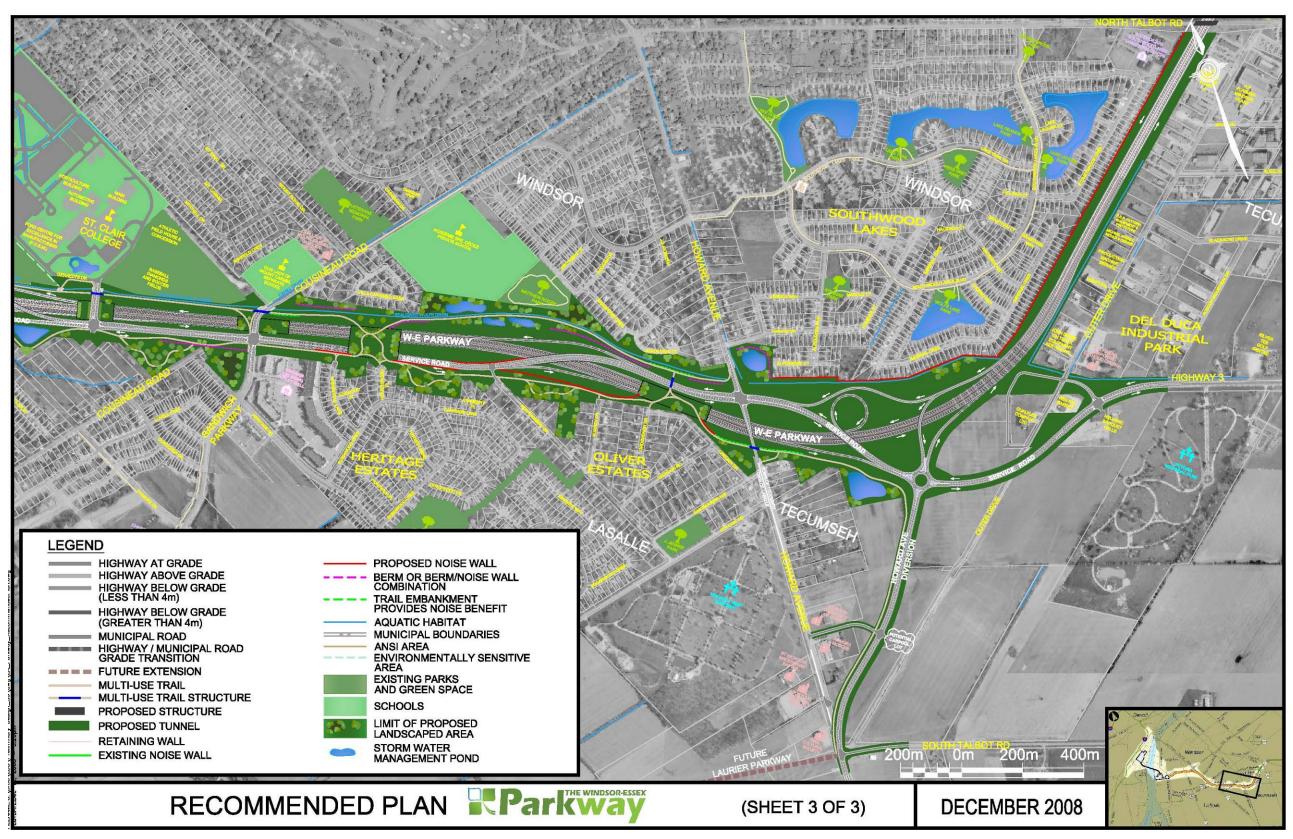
C. PROPOSED PLAN VIEW OF THE WINDSOR-ESSEX PARKWAY.
